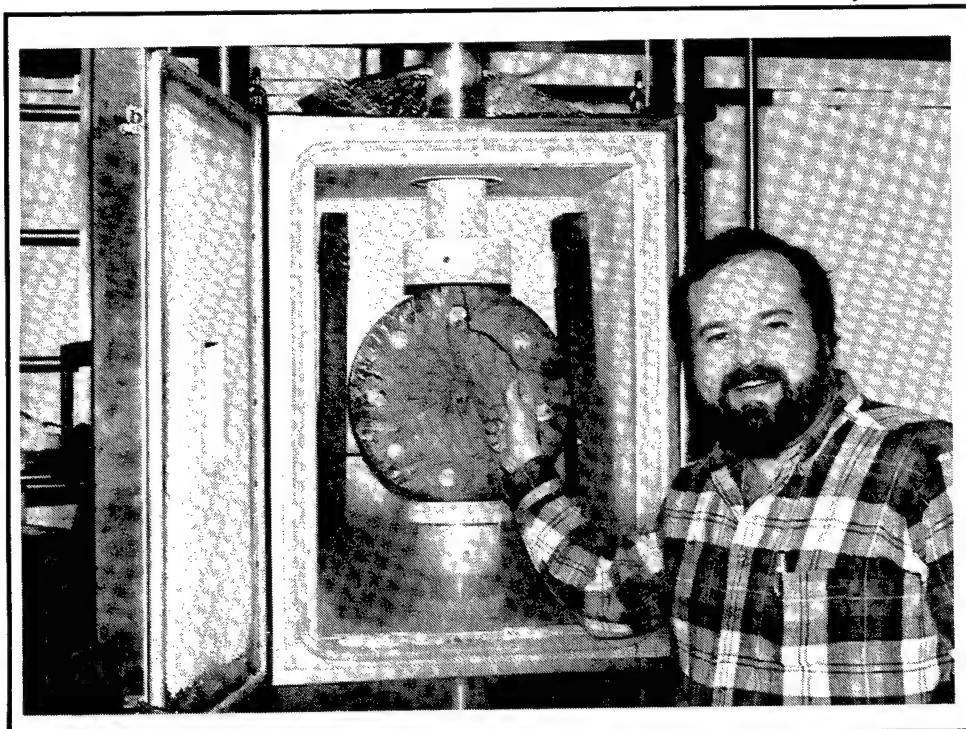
Test apparatus used to conduct radial compression of fender piling sections.
